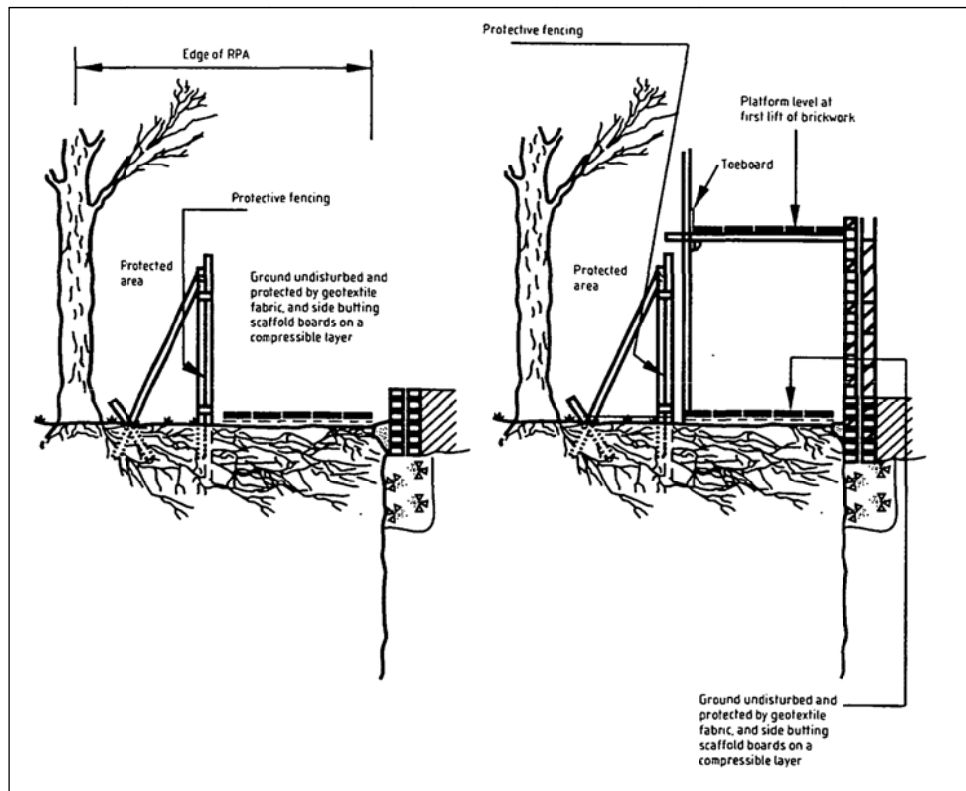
BS5837:2005 Temporary Ground Protection – Recommended Construction
